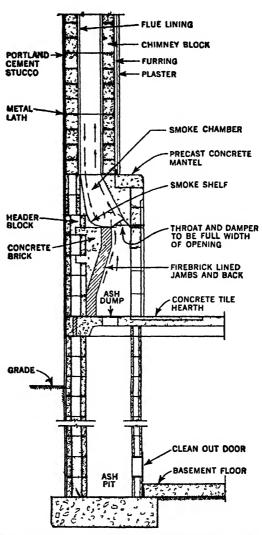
A.—Typical section through fireplace and ash pit using concrete masonly units.
